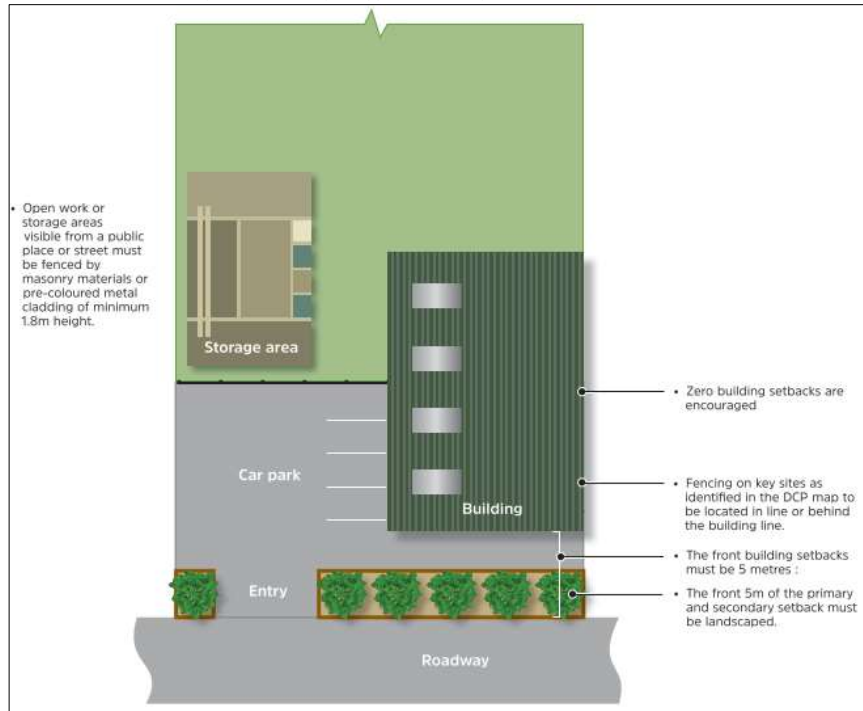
Typical Site Layout - Ring Road (Bandaar Drive) and Goddard Lane Sites only
